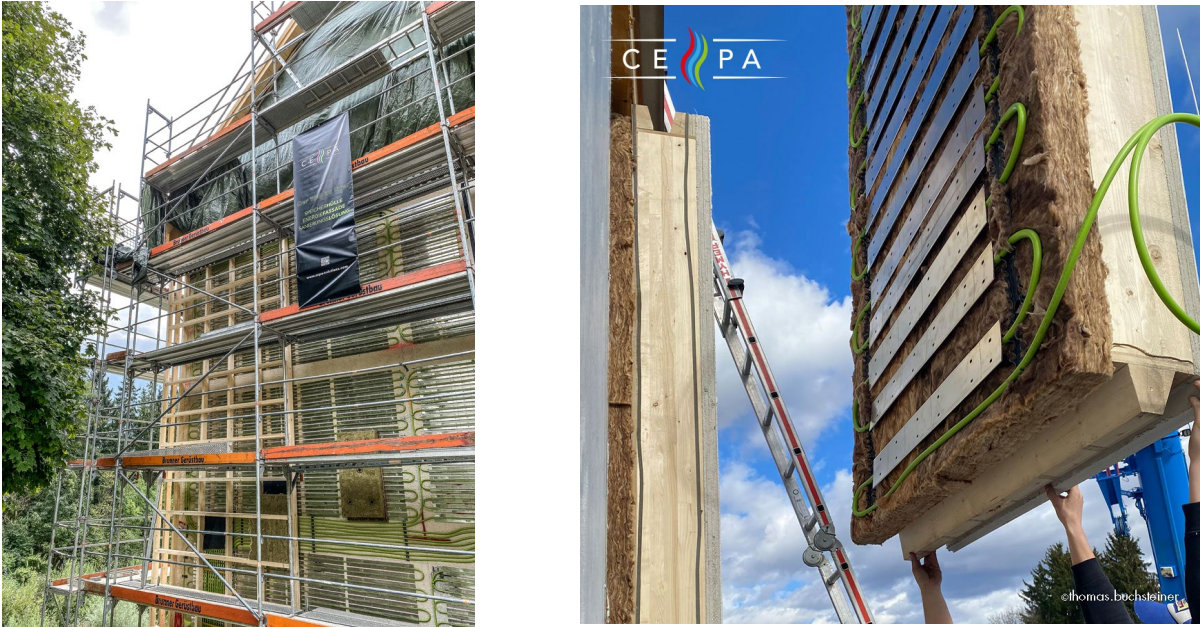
CEPA heating/cooling layer installed on a multifamily house in Austria from Südsan-Project (left) and CEPA system installed in prefabricated façade element for serial renovation (right) source Tower3000
